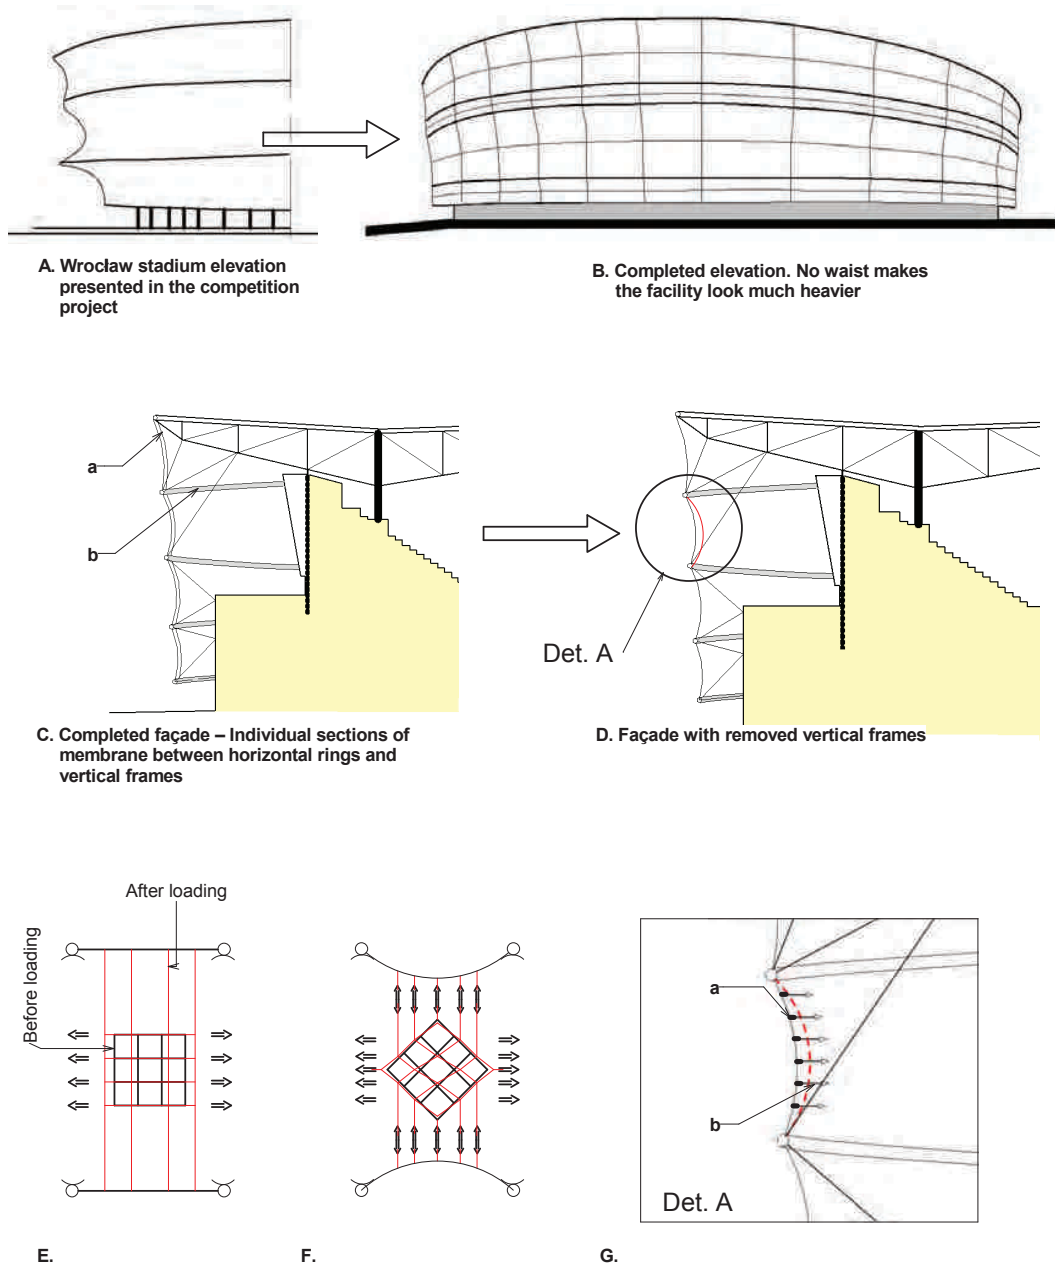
The method of achieving deeper vertical and horizontal curvatures in the membrane of the façade of the Wrocław stadium. A) Elevation presented in the competition project. B) Completed elevation. No waist makes the facility look much heavier; new tension member inserted horizontally into the membrane. C) Completed façade – Individual sections of membrane between horizontal rings and vertical frames: a – vertical frame, b – horizontal ring. D) Façade with removed vertical frames. E, F) Schematic views show the supporting strips in the membrane and the load direction. Only in F), the horizontal tension caused by new horizontal tension members causes the concurrent stretch of both perpendicular strips of the membrane and its biaxial tension. G) Stretch of the membrane caused by new horizontal tension members (Det. A.) increases horizontal forces in the membrane and its deeper curvatures. In order to achieve an architecturally attractive surface with two curvilinear planes, it is necessary to generate at the same time a vertical stretch of the membrane. In order to achieve that the pattern of the supporting strips in the membrane should be diagonal as shown in the schematic below F) a – new tension member inserted into the membrane horizontally, b – tensile forces from new horizontal tension members.
